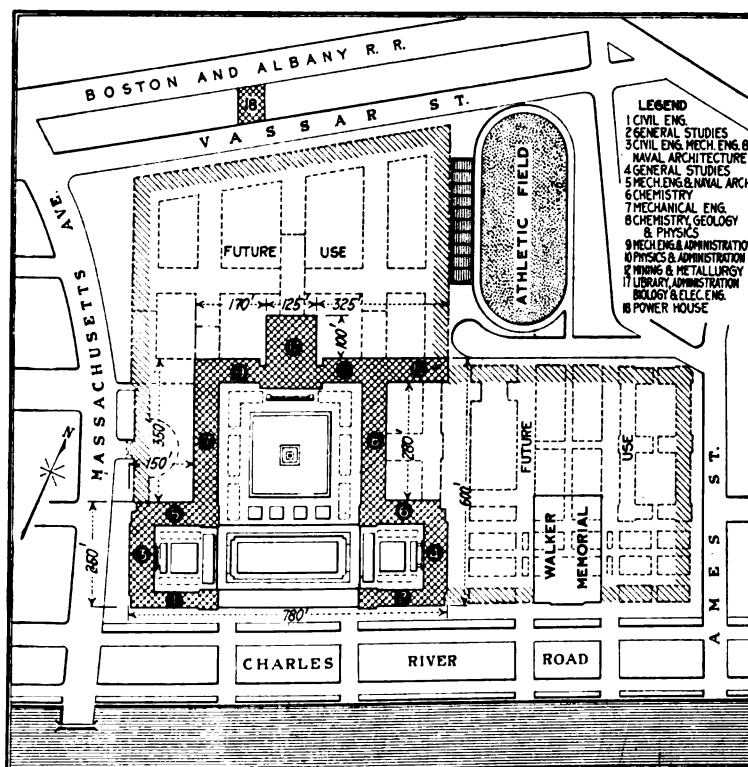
PLAN OF THE NEW MASSACHUSETTS INSTITUTE OF TECHNOLOGY
